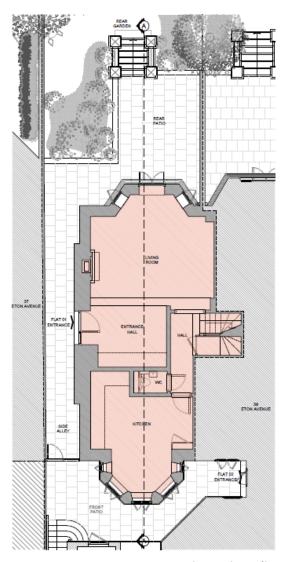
Existing Site Plan red-lining Flat 1, 39 Eton Avenue where works are proposed. No works are proposed elsewhere onsite.
